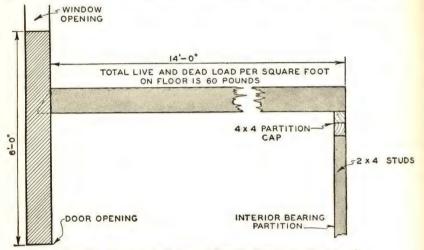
Illustration of Method Used in Calculating Joist Loads
